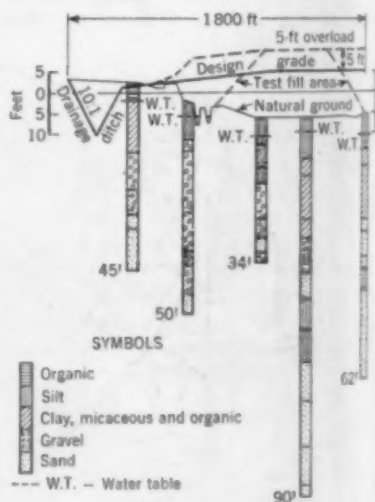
TYPICAL CROSS SECTION shows present ground elevations, borings, design grade, overload section and test fill. Periodic observations of settlement of test fill are made to verify laboratory conclusions.
